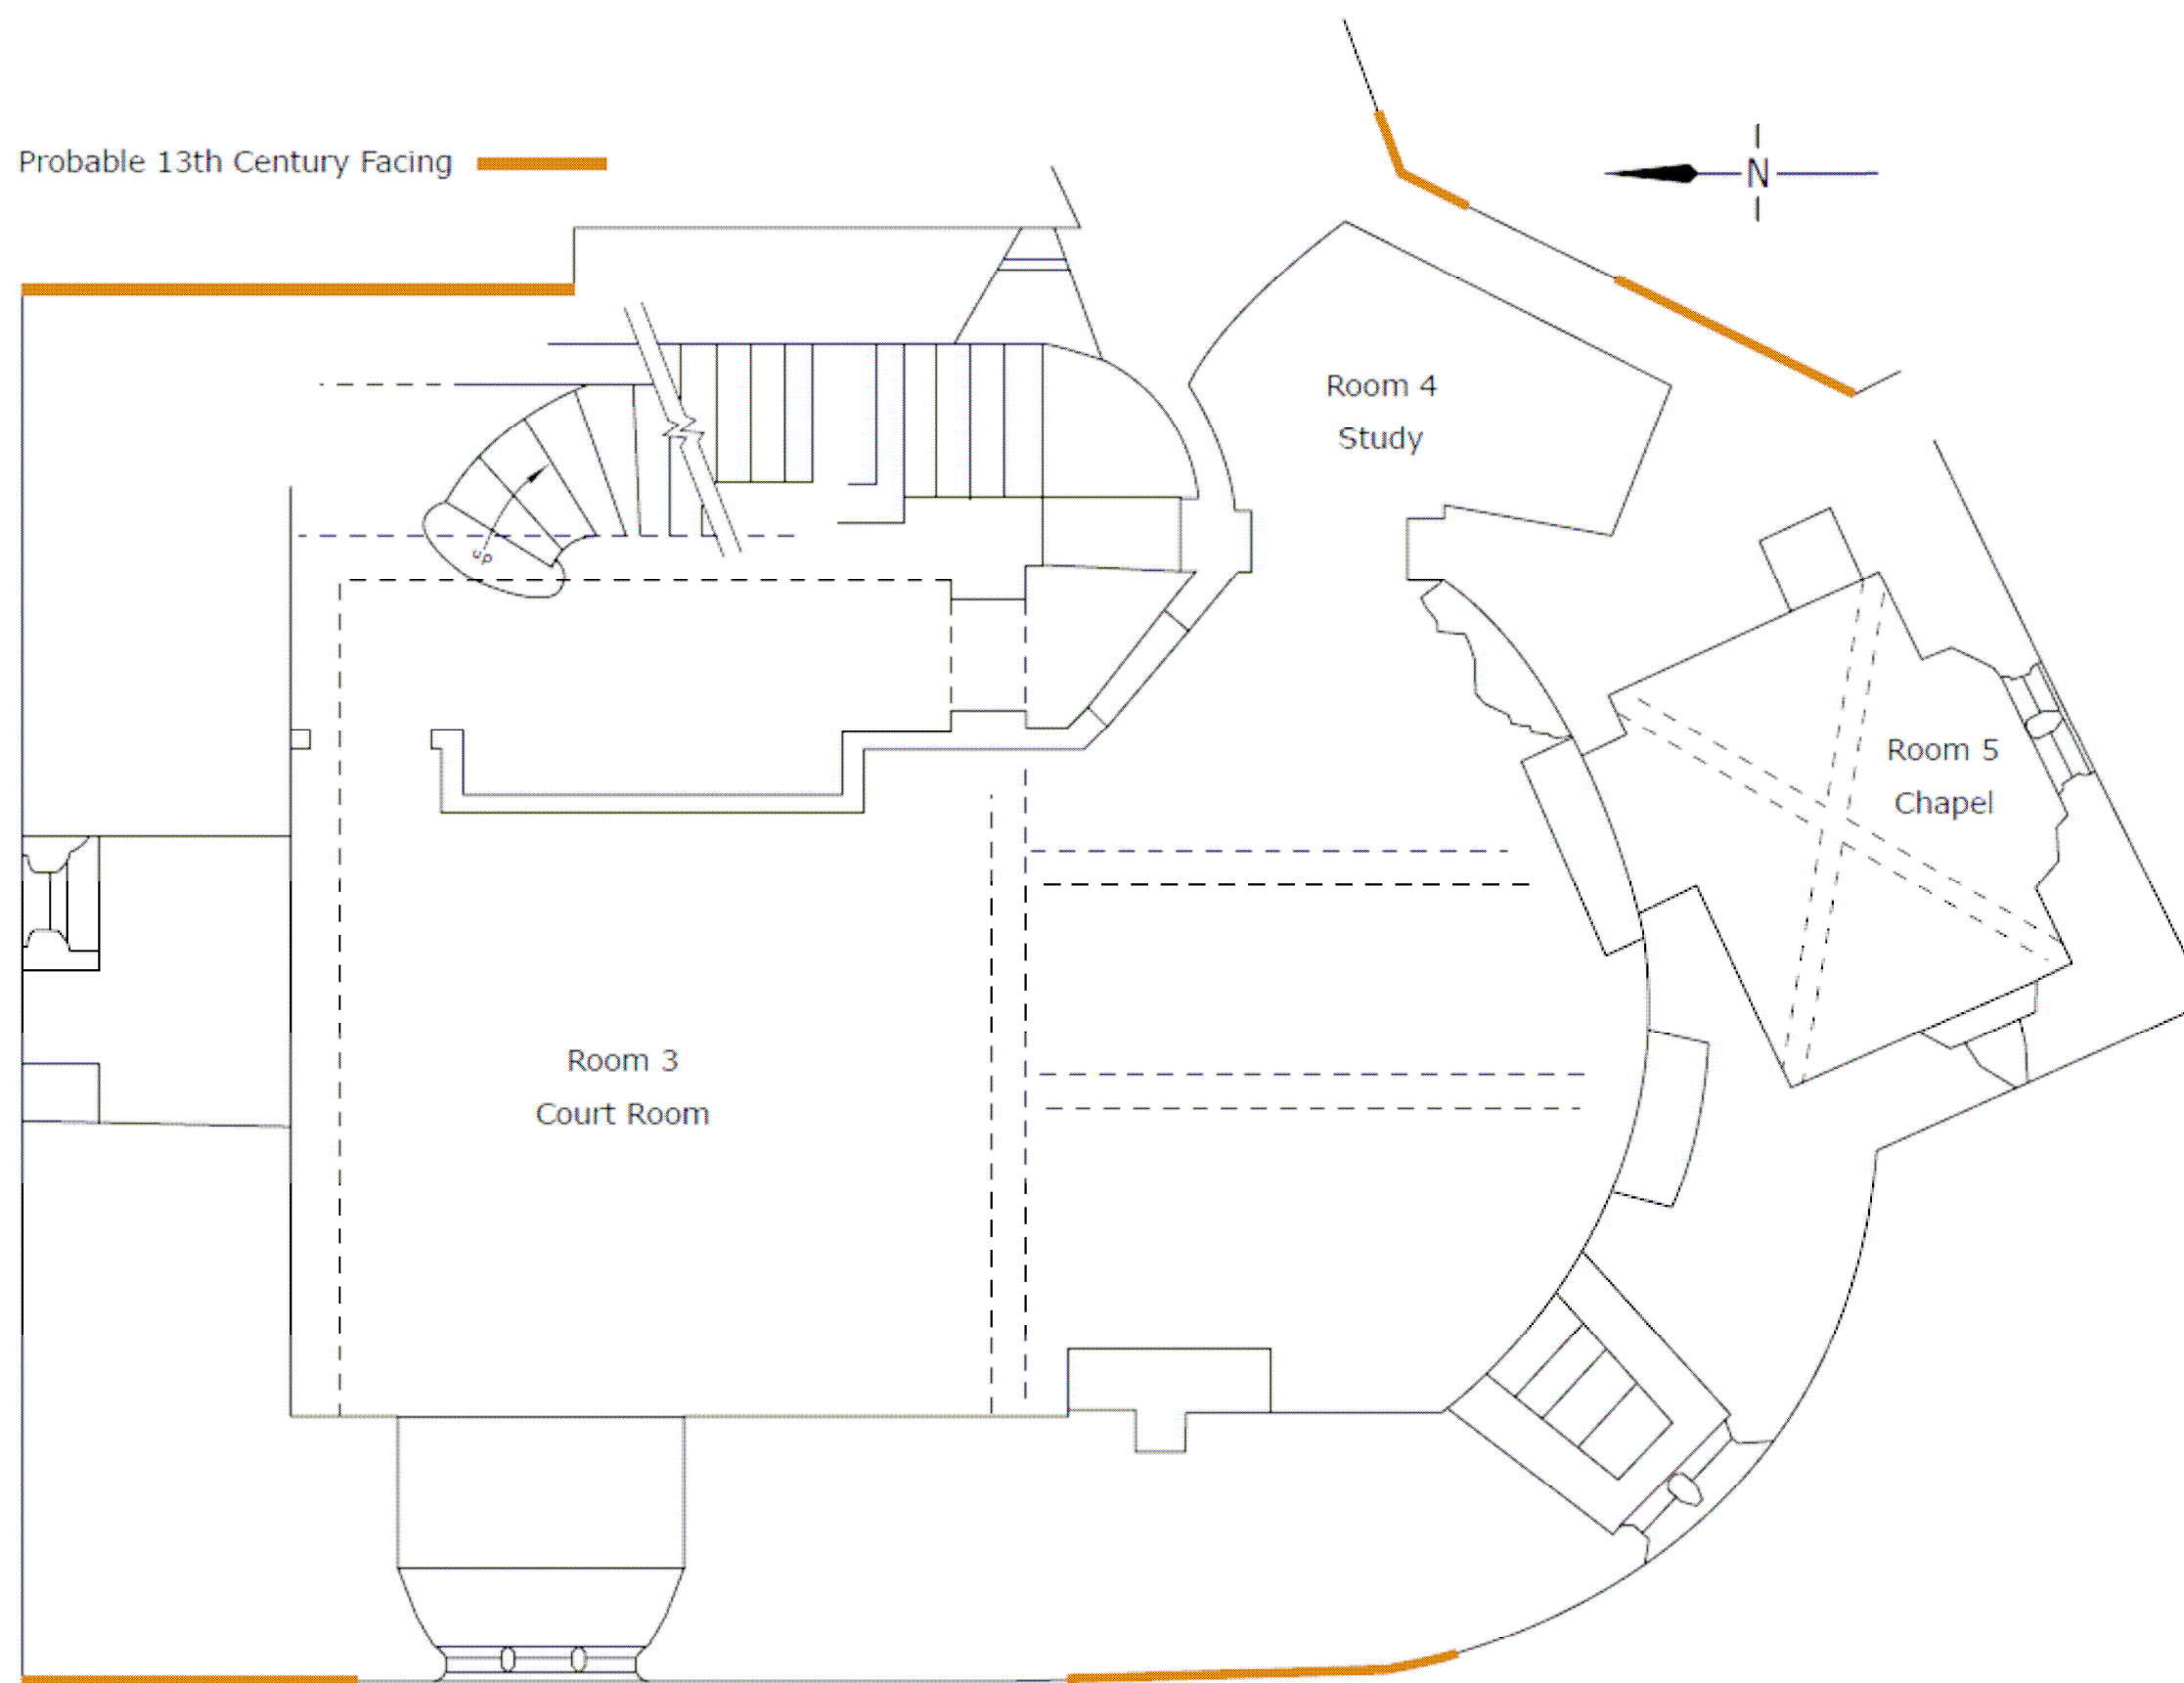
First Floor Plan of Roch Castle (based on RCAHMW survey)
